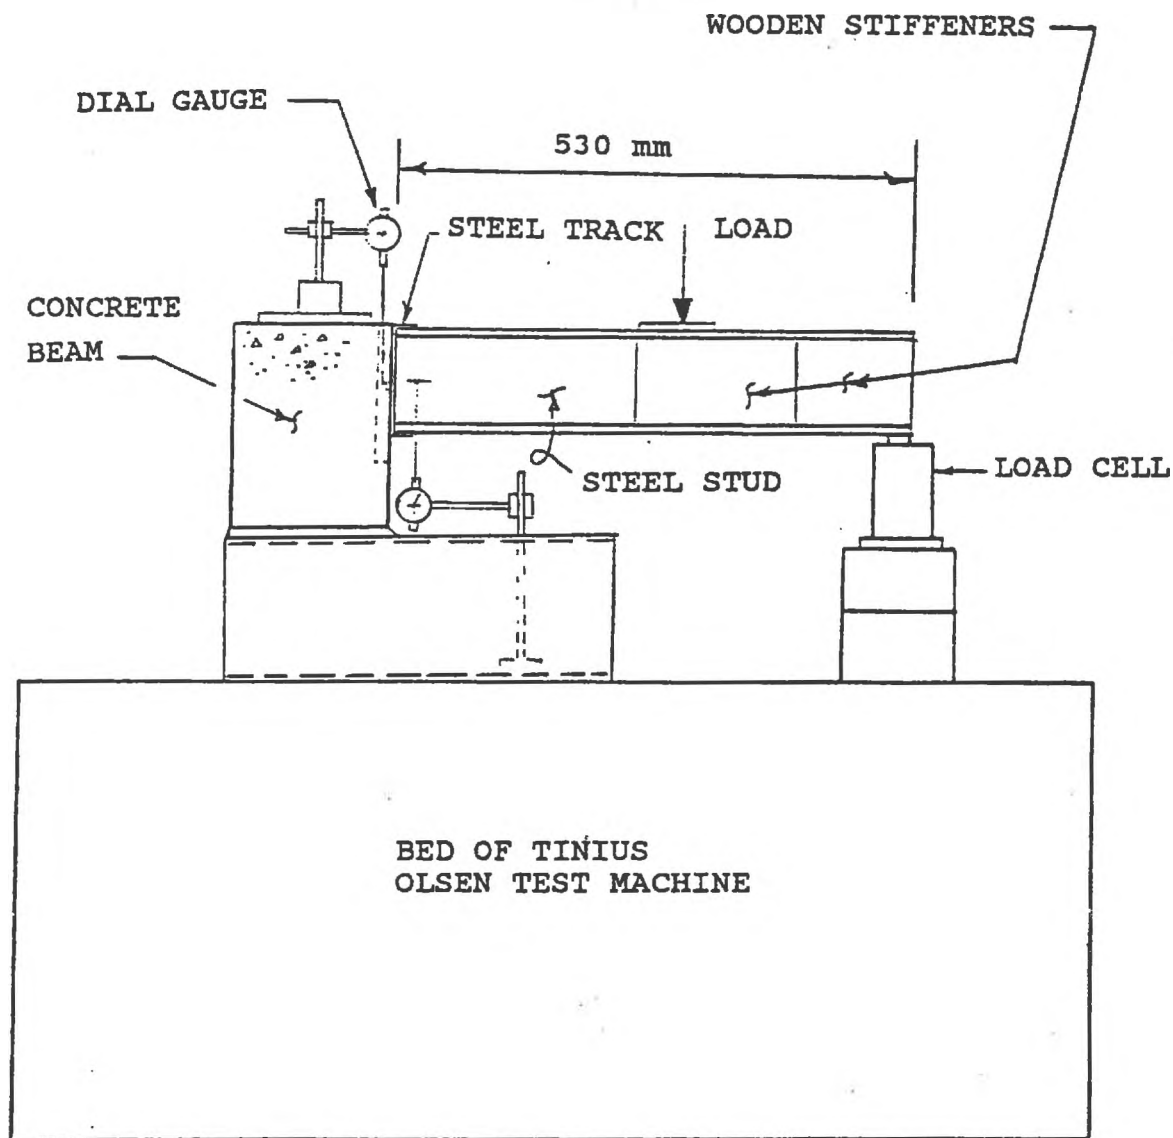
Experimental Set Up Used for Steel Stud to Track Connection Tests
